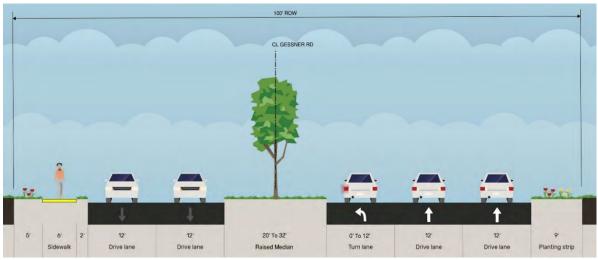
Proposed Typical Section – Gessner Road (City's southwest limits to Memorial Dr)
